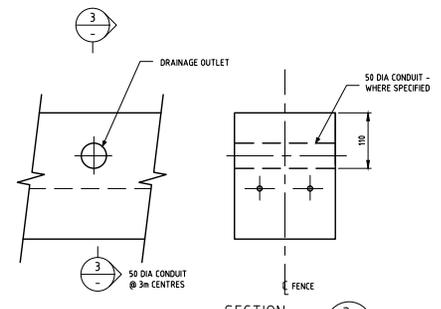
25 L SUPPORT CABLE INSTALLATION 5302
